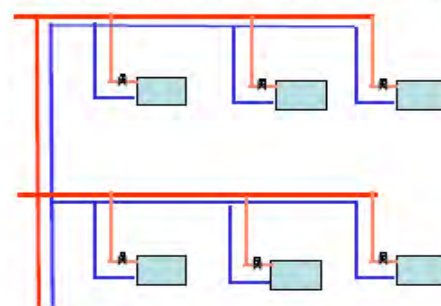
Sketch drawing of operation of horizontal household circuit system
